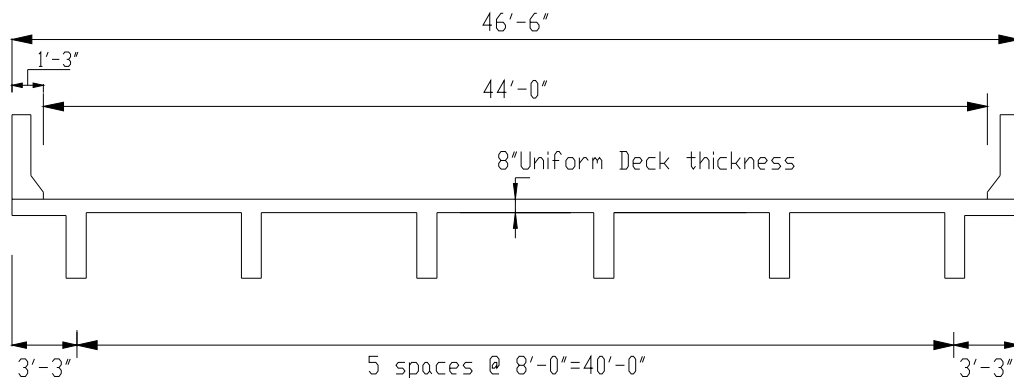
T-Beam Bridge Cross Section (Barker 2007).
